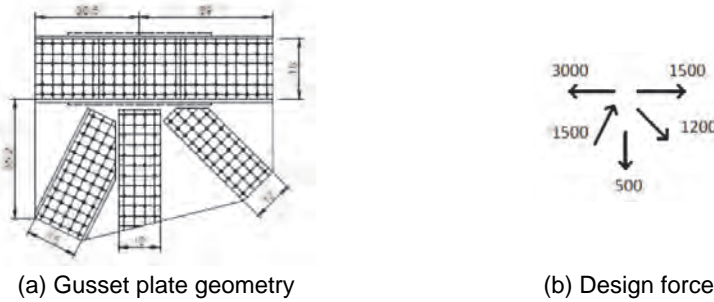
Gusset plate geometry and truss member design forces for P5-C-WV-NP
